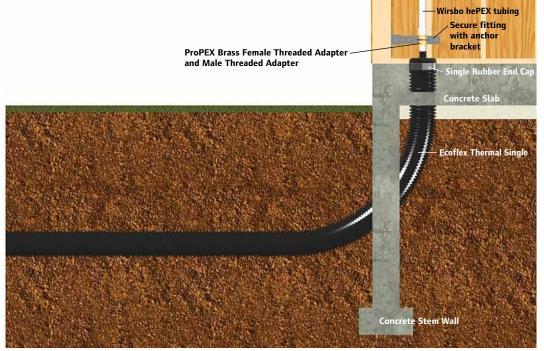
Slab-on-grade Through knockout Installation – Outside Wall Attachment
